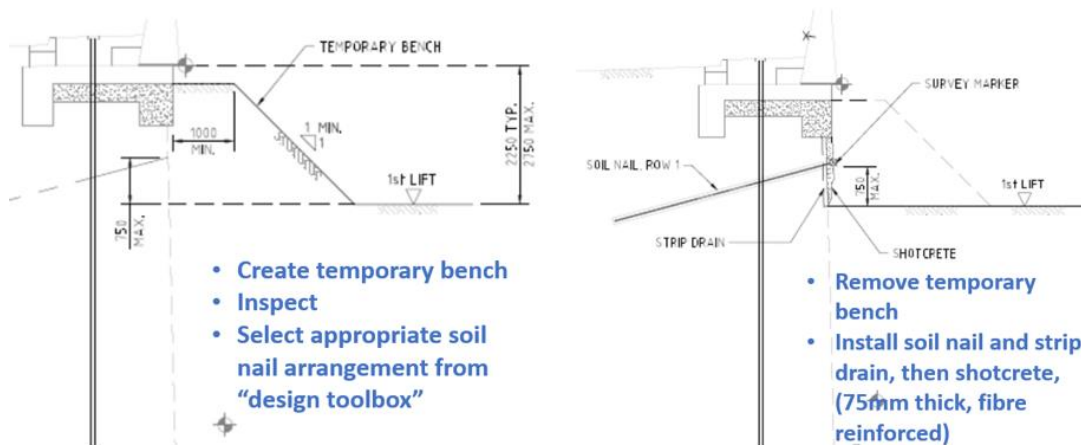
Implementing the observational method during construction of a soil nail/shotcrete wall
